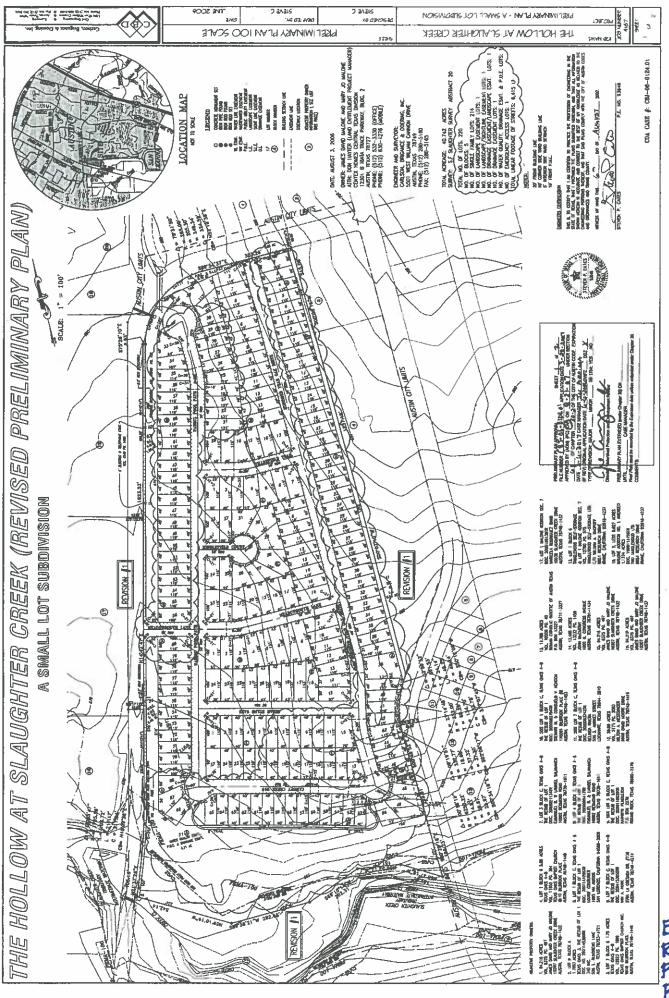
EXHIBIT C REVISED PRELIMINARY PLAN C14-2011-0008 Page 5 of 7
